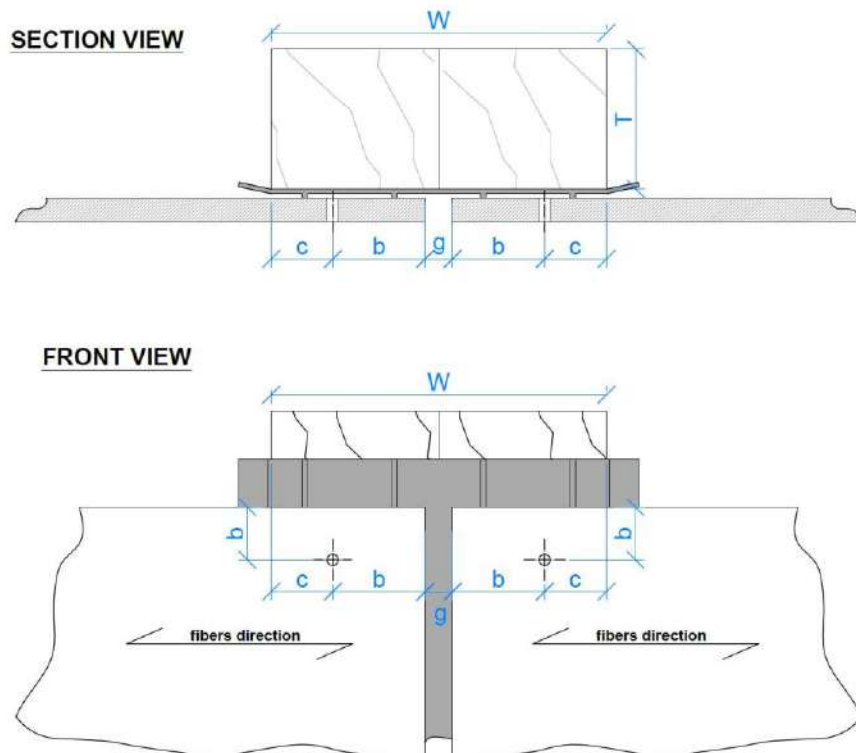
Geometrical specifications of the cladding required to determine the width of the wooden beams of the subframe
